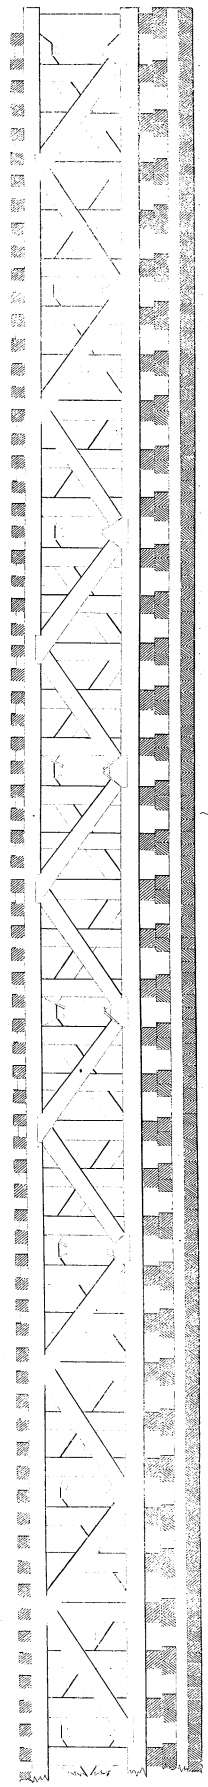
ELEVATION OF TRUSS WORK SUPPORTING SLOPING RIBS. (A.)
